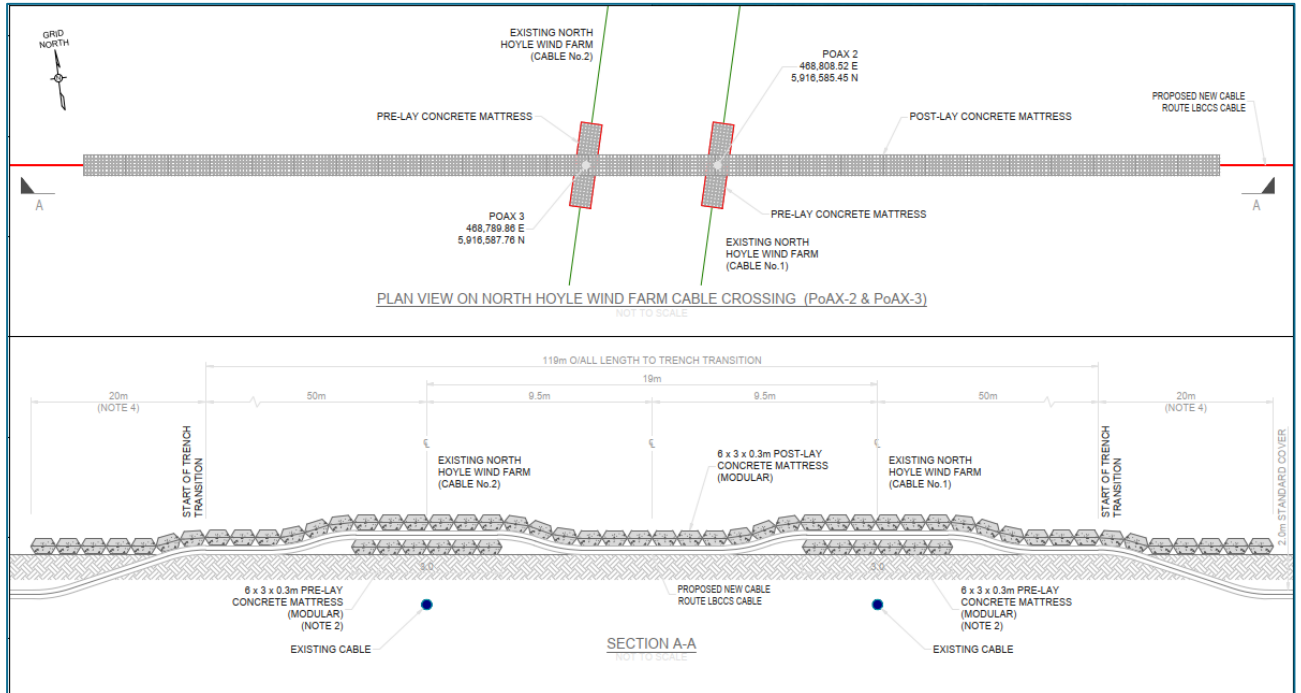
Plan view, and elevation of PoAX-2 and PoAX-3 crossings with mattress protection
